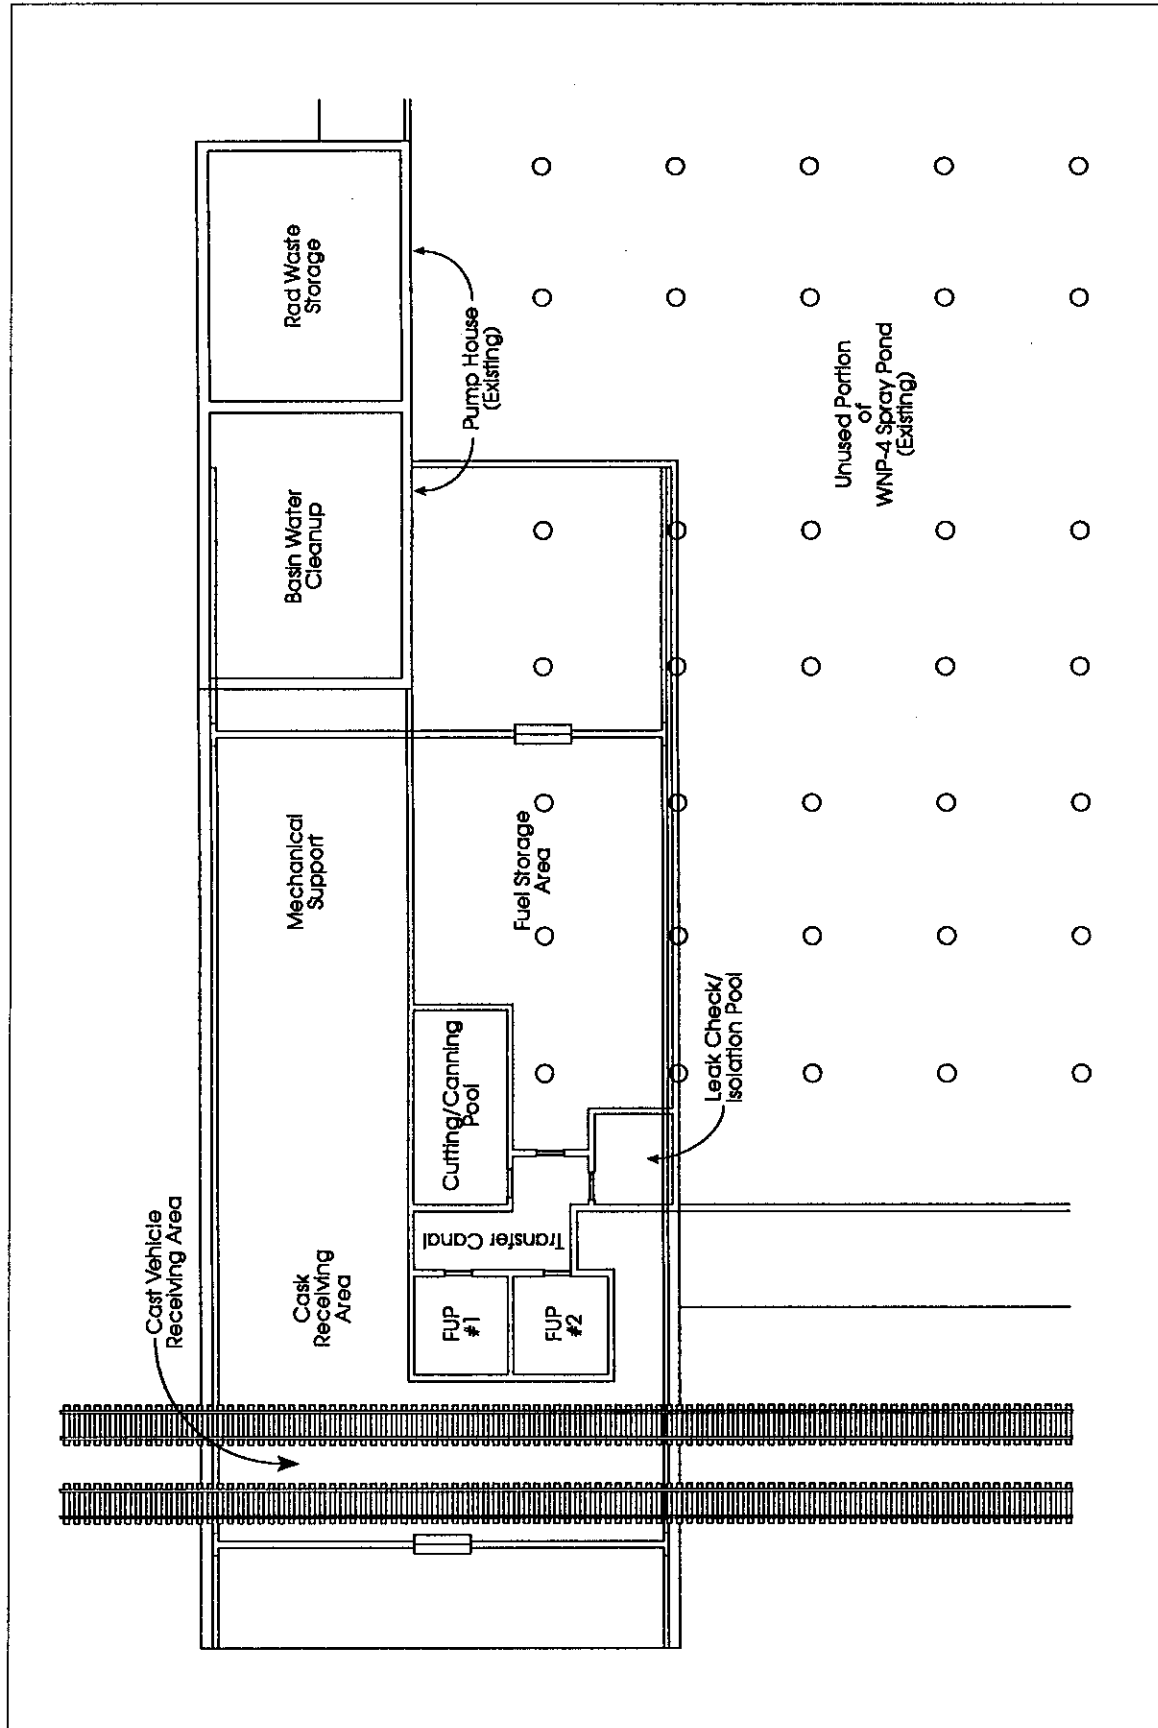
Washington Nuclear Plant-4 Spray Pond (with Modifications) Schematic
